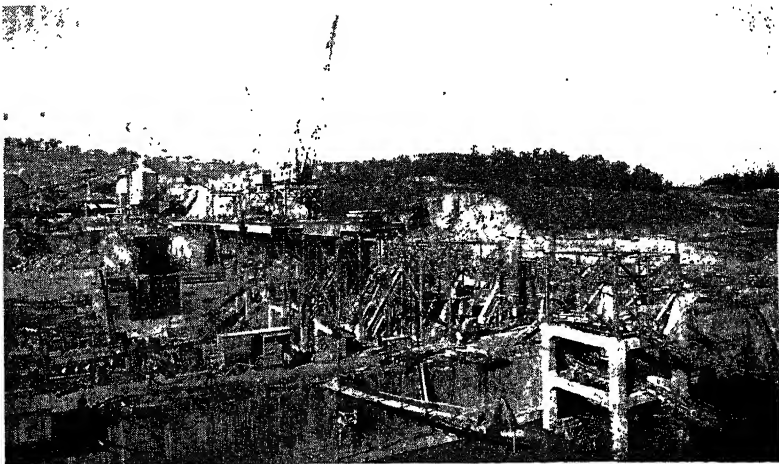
Construction bridge during erection. Note diversion channel in foreground.
